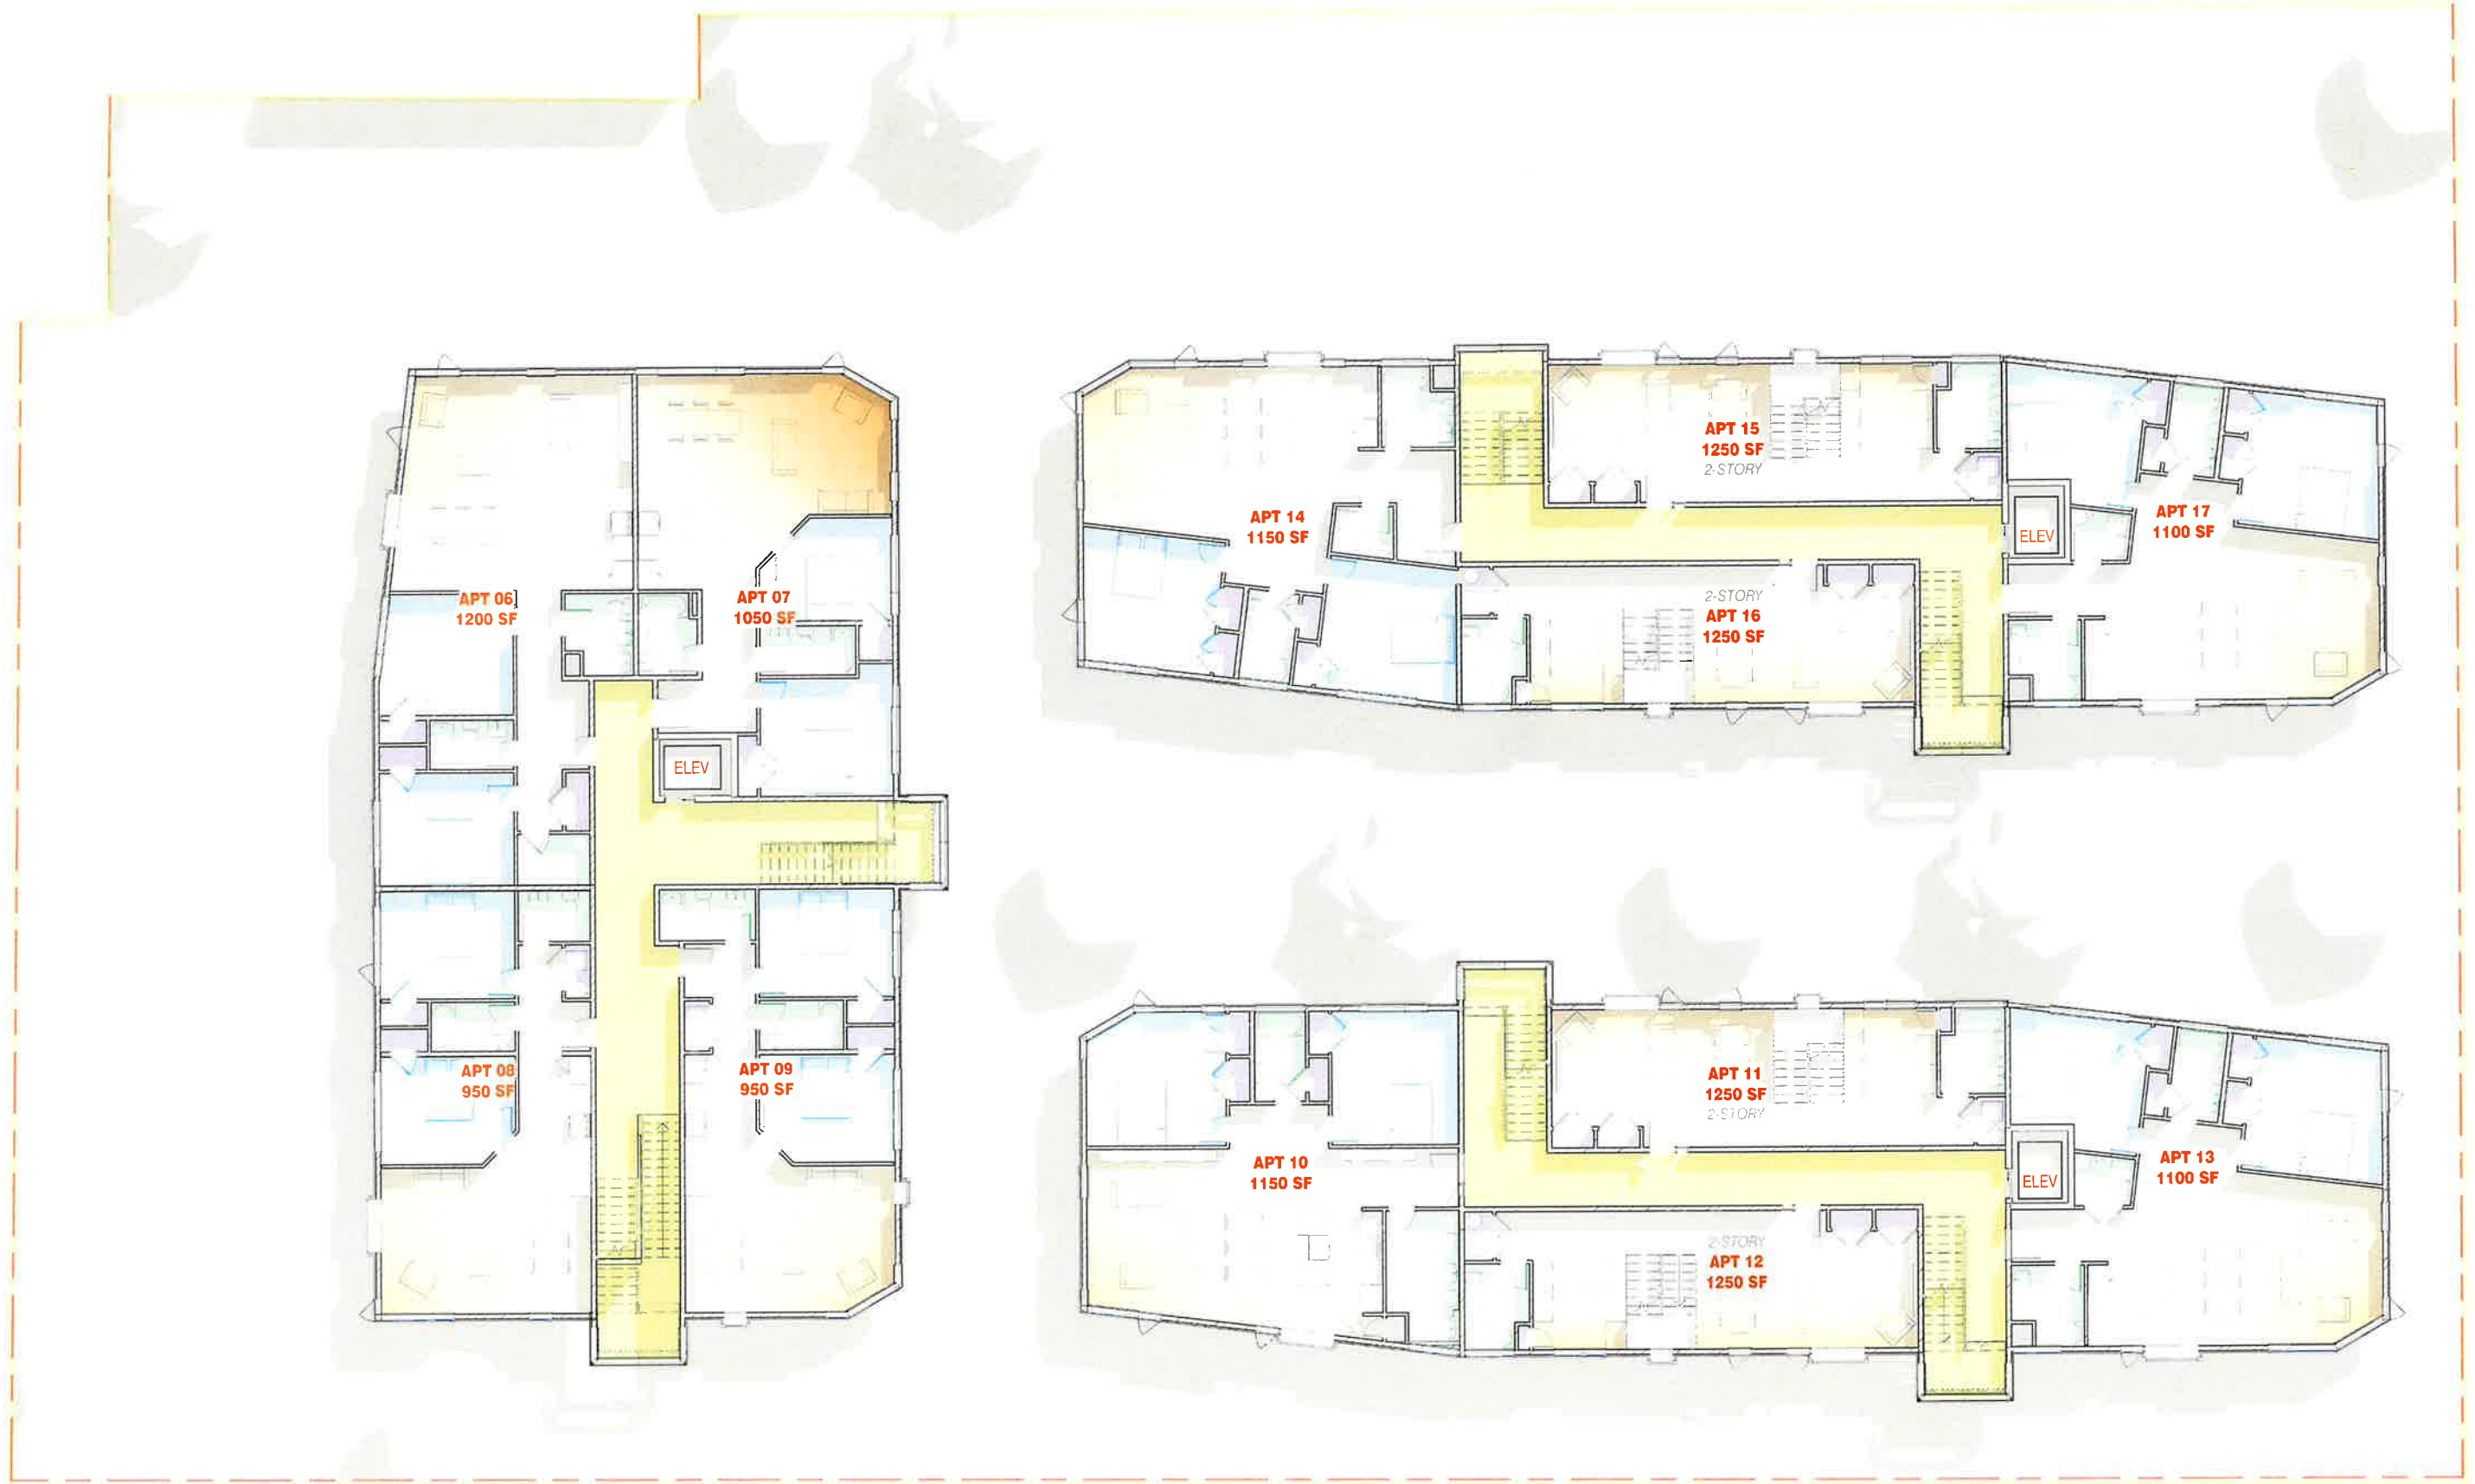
LEVEL 02 FLOOR PLAN
